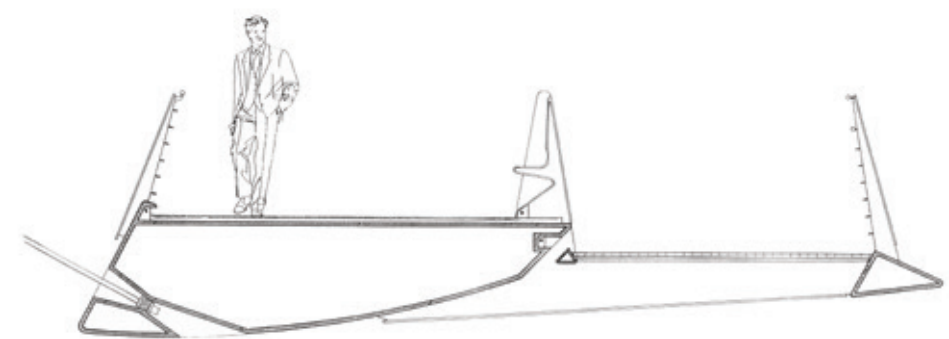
Wilkinson Eyre's drawing of a typical cross section of the deck of The Millennium Bridge, Gateshead
